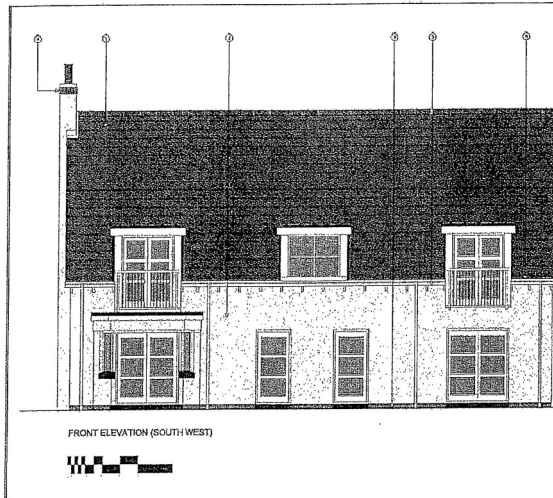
Drawing L(-)03 Front Elevation (South West) as proposed
